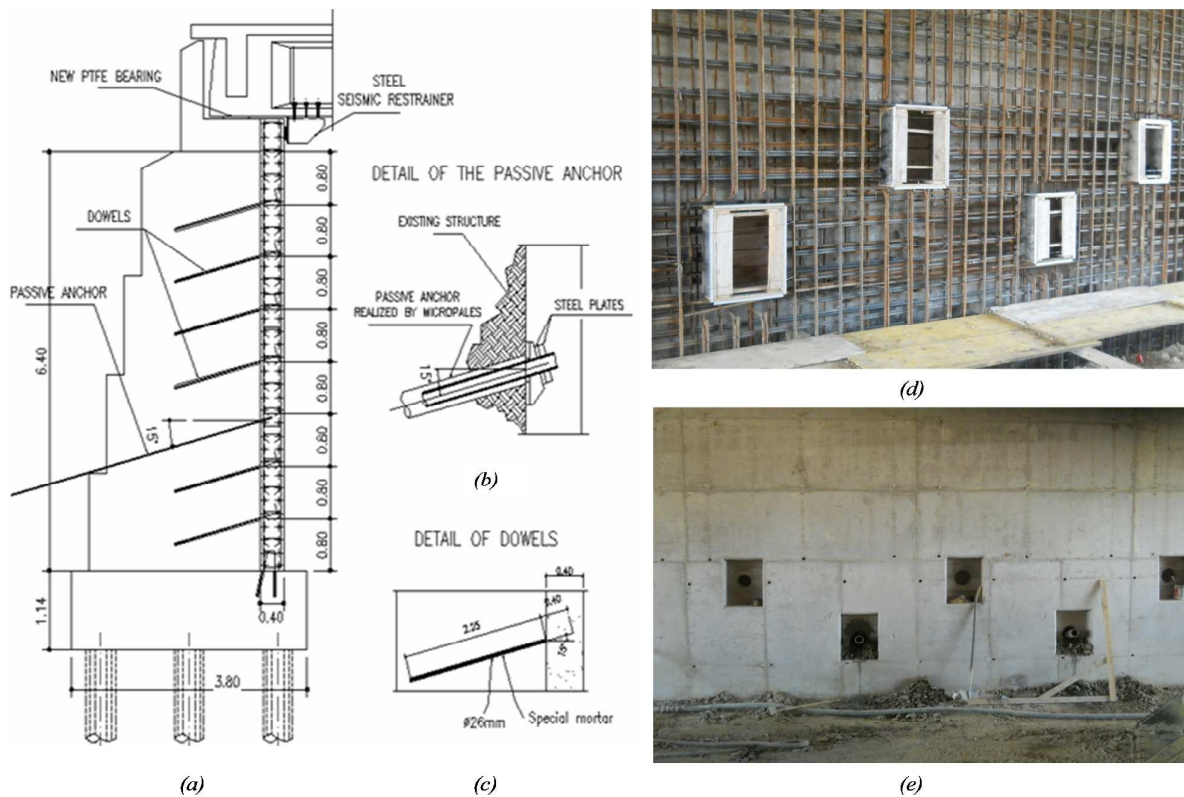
Seismic retrofitting intervention. (a) Transversal section of existing abutment. (b) Detail of passive anchor. (c) Detail of dowels. (d) Positioning of steel reinforcement of the concrete cover. (e) Arrangement for passive anchors.
